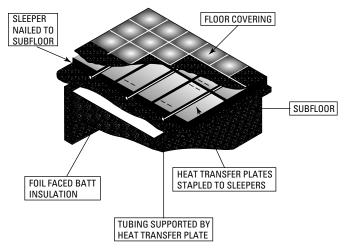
Tubing installed above the subfloor between sleepers with heat-transfer plates. (Courtesy Weil-McLain)
